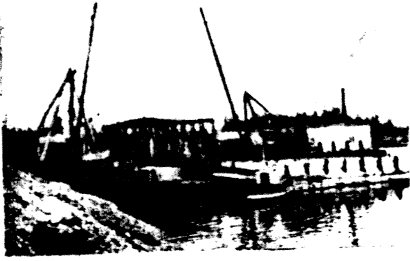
General arrangement of surface plant. Larger derrick at left handled excavation and concrete. Smaller derrick at right moved aggregate and steel.
